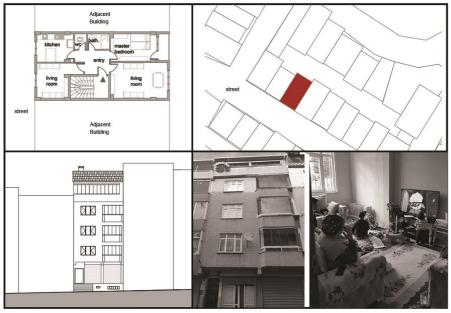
An example of the urban home: plan, site plan, view and photos (URBAN NO: 6)
